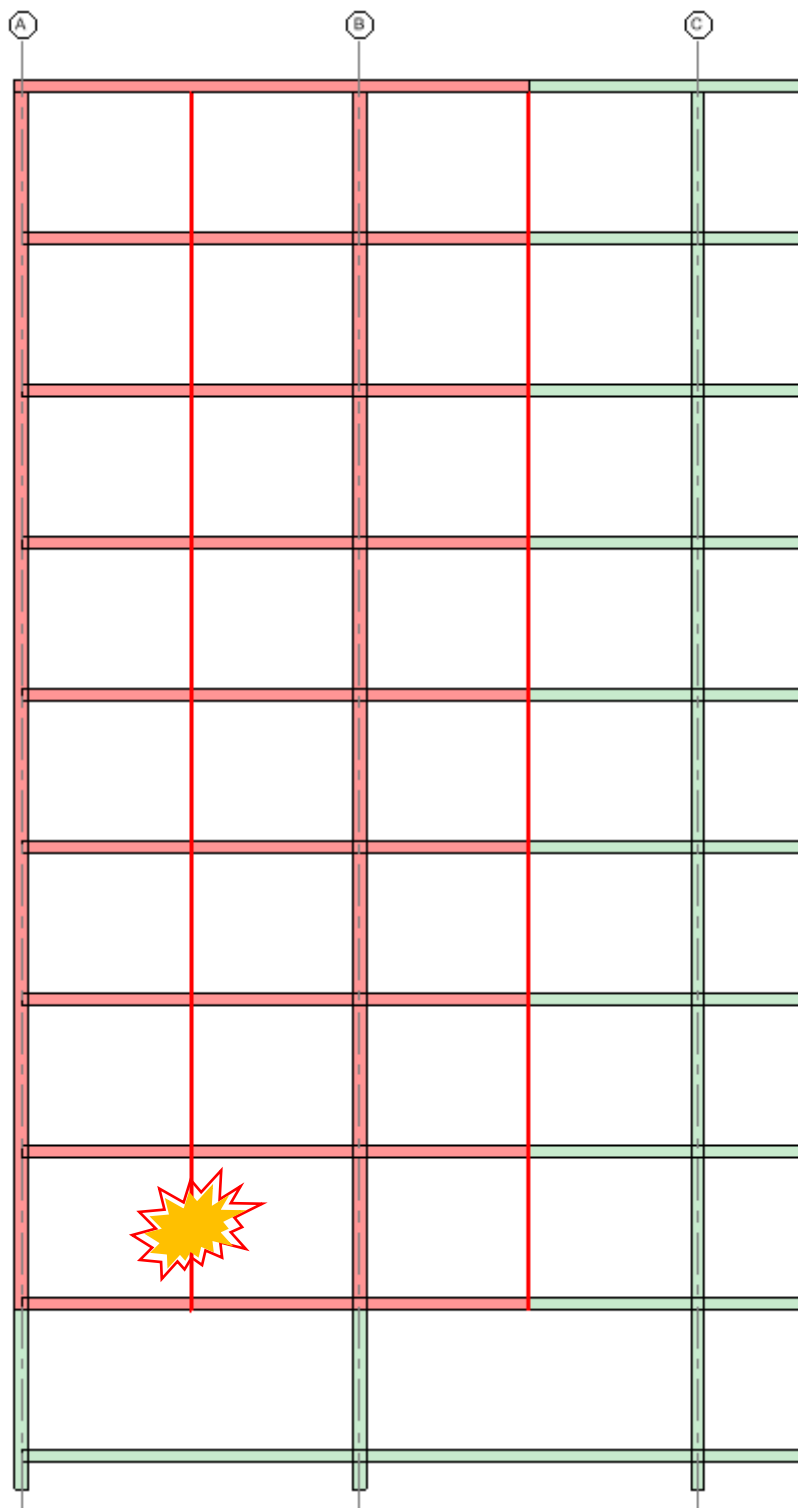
Collapse mechanism if explosion event occurs within a flank wall flat, Haviland & John Cozens house (elevation)
